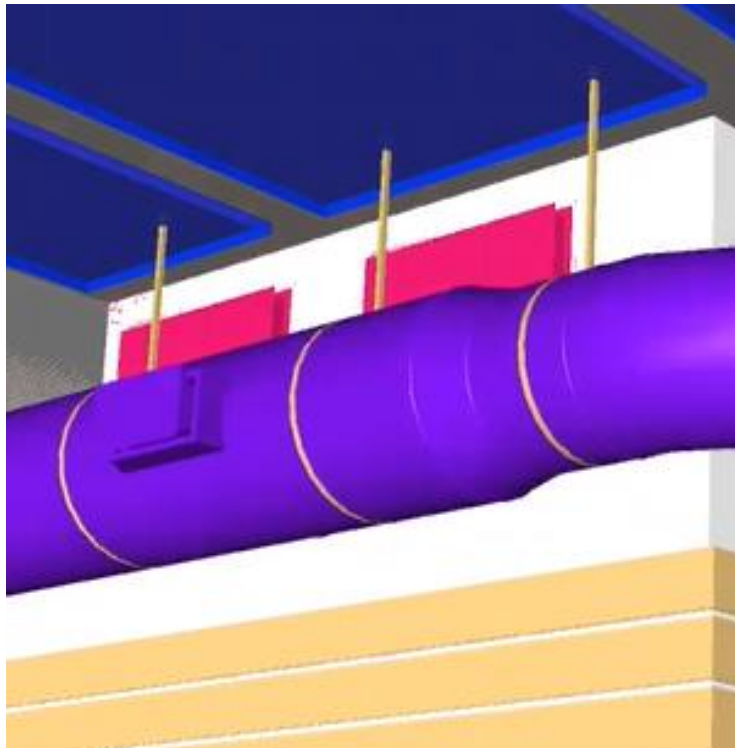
Hangers holding the HVAC ducts clashing with ceiling fabric.
